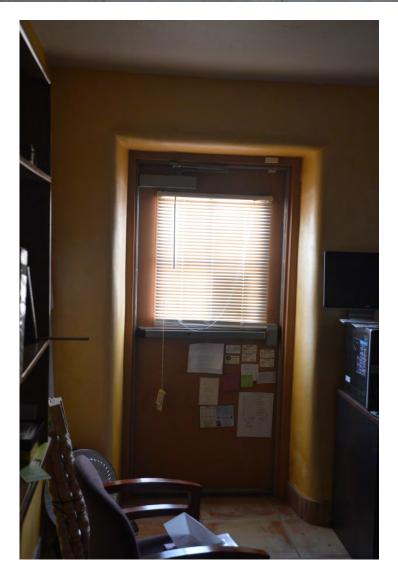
PHOTO OF WALL SHOWING OTHER DOORS, AND WINDOW TO BE REPLACED
